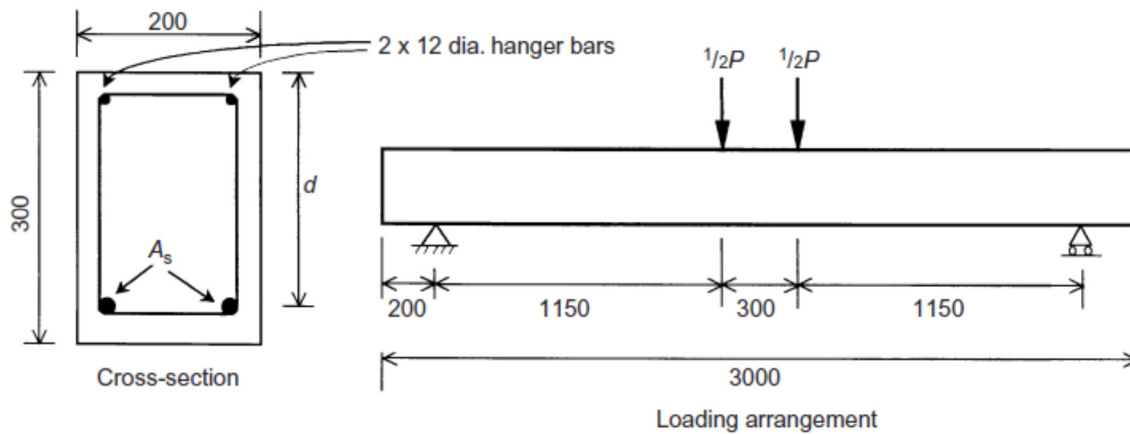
Beam cross section and loading arrangement (Pam et al, 2001)
